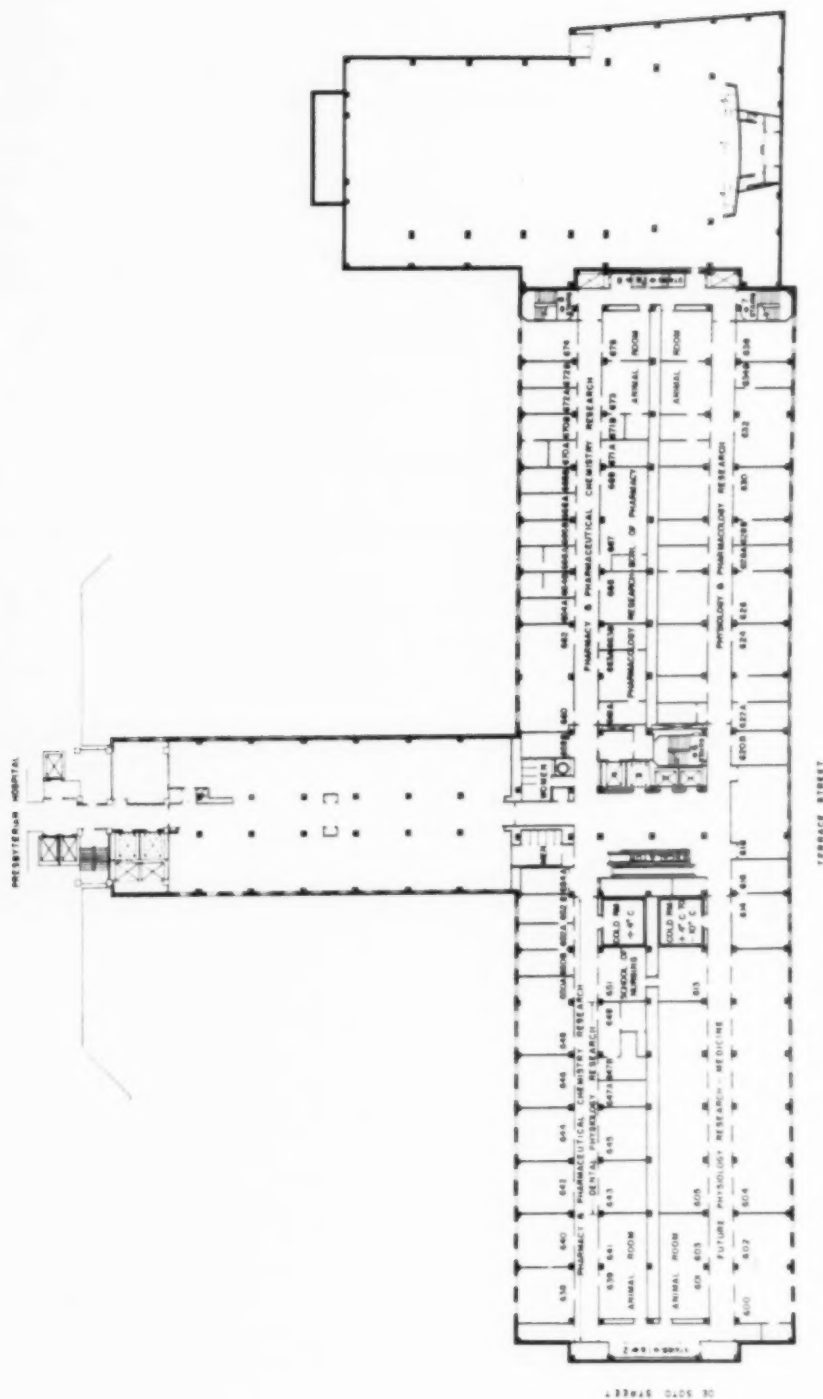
SIXTH FLOOR PLAN, SCHOOLS OF THE HEALTH PROFESSIONS BUILDING,
